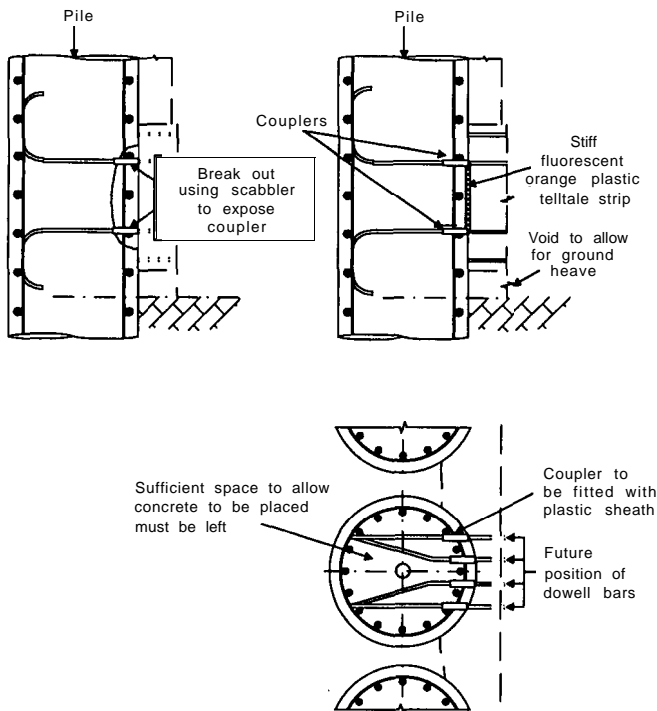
Detail of base slab / piled wall junction. A construction detail which makes it difficult to use either Type A or Type C protection
